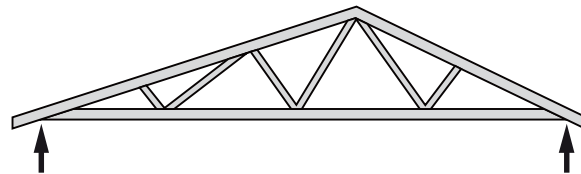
(in part) ROOF TRUSS AND SYSTEM TERMINOLOGY
